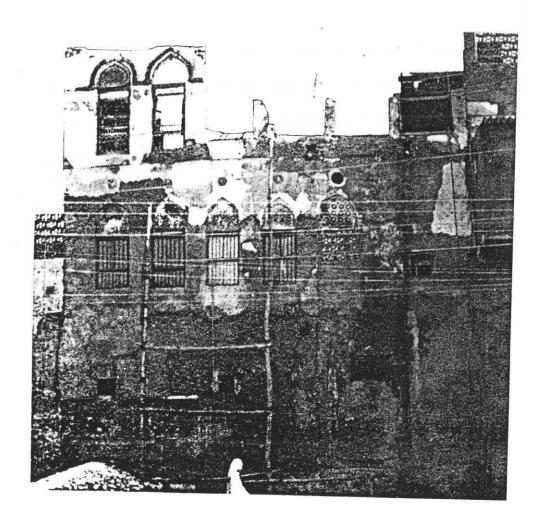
The crumbling upper storey of a traditional house, Mutrah, Yemen.
